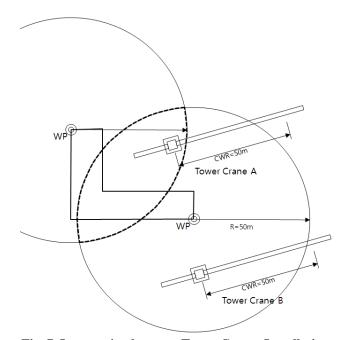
Intersection between Tower Cranes Installation Areas (CWR=50m)
